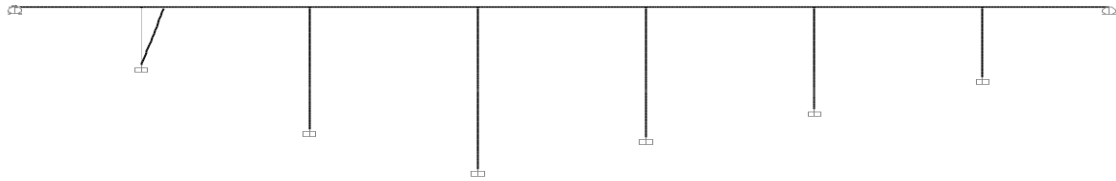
Bridge deformed shape when the rotation imposition on the pillar P1
